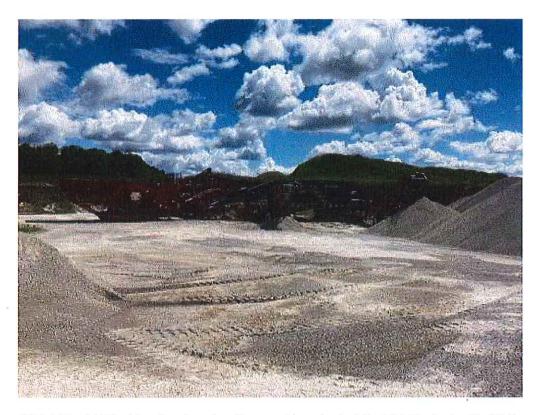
(Flat Rock Pit) : Havelka Construction crushing plant at the Flat Rock plant in Wallace, MI.
